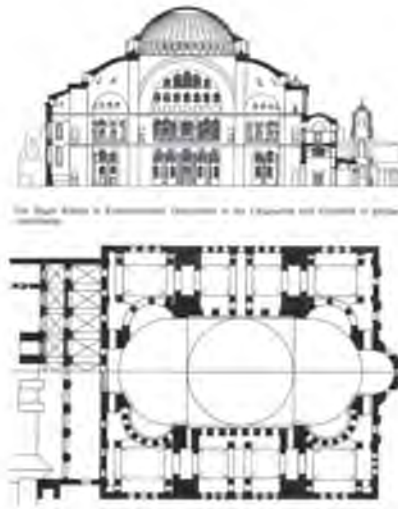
Cross-section in the longitudinal axis and floor plan in the same arrangement
